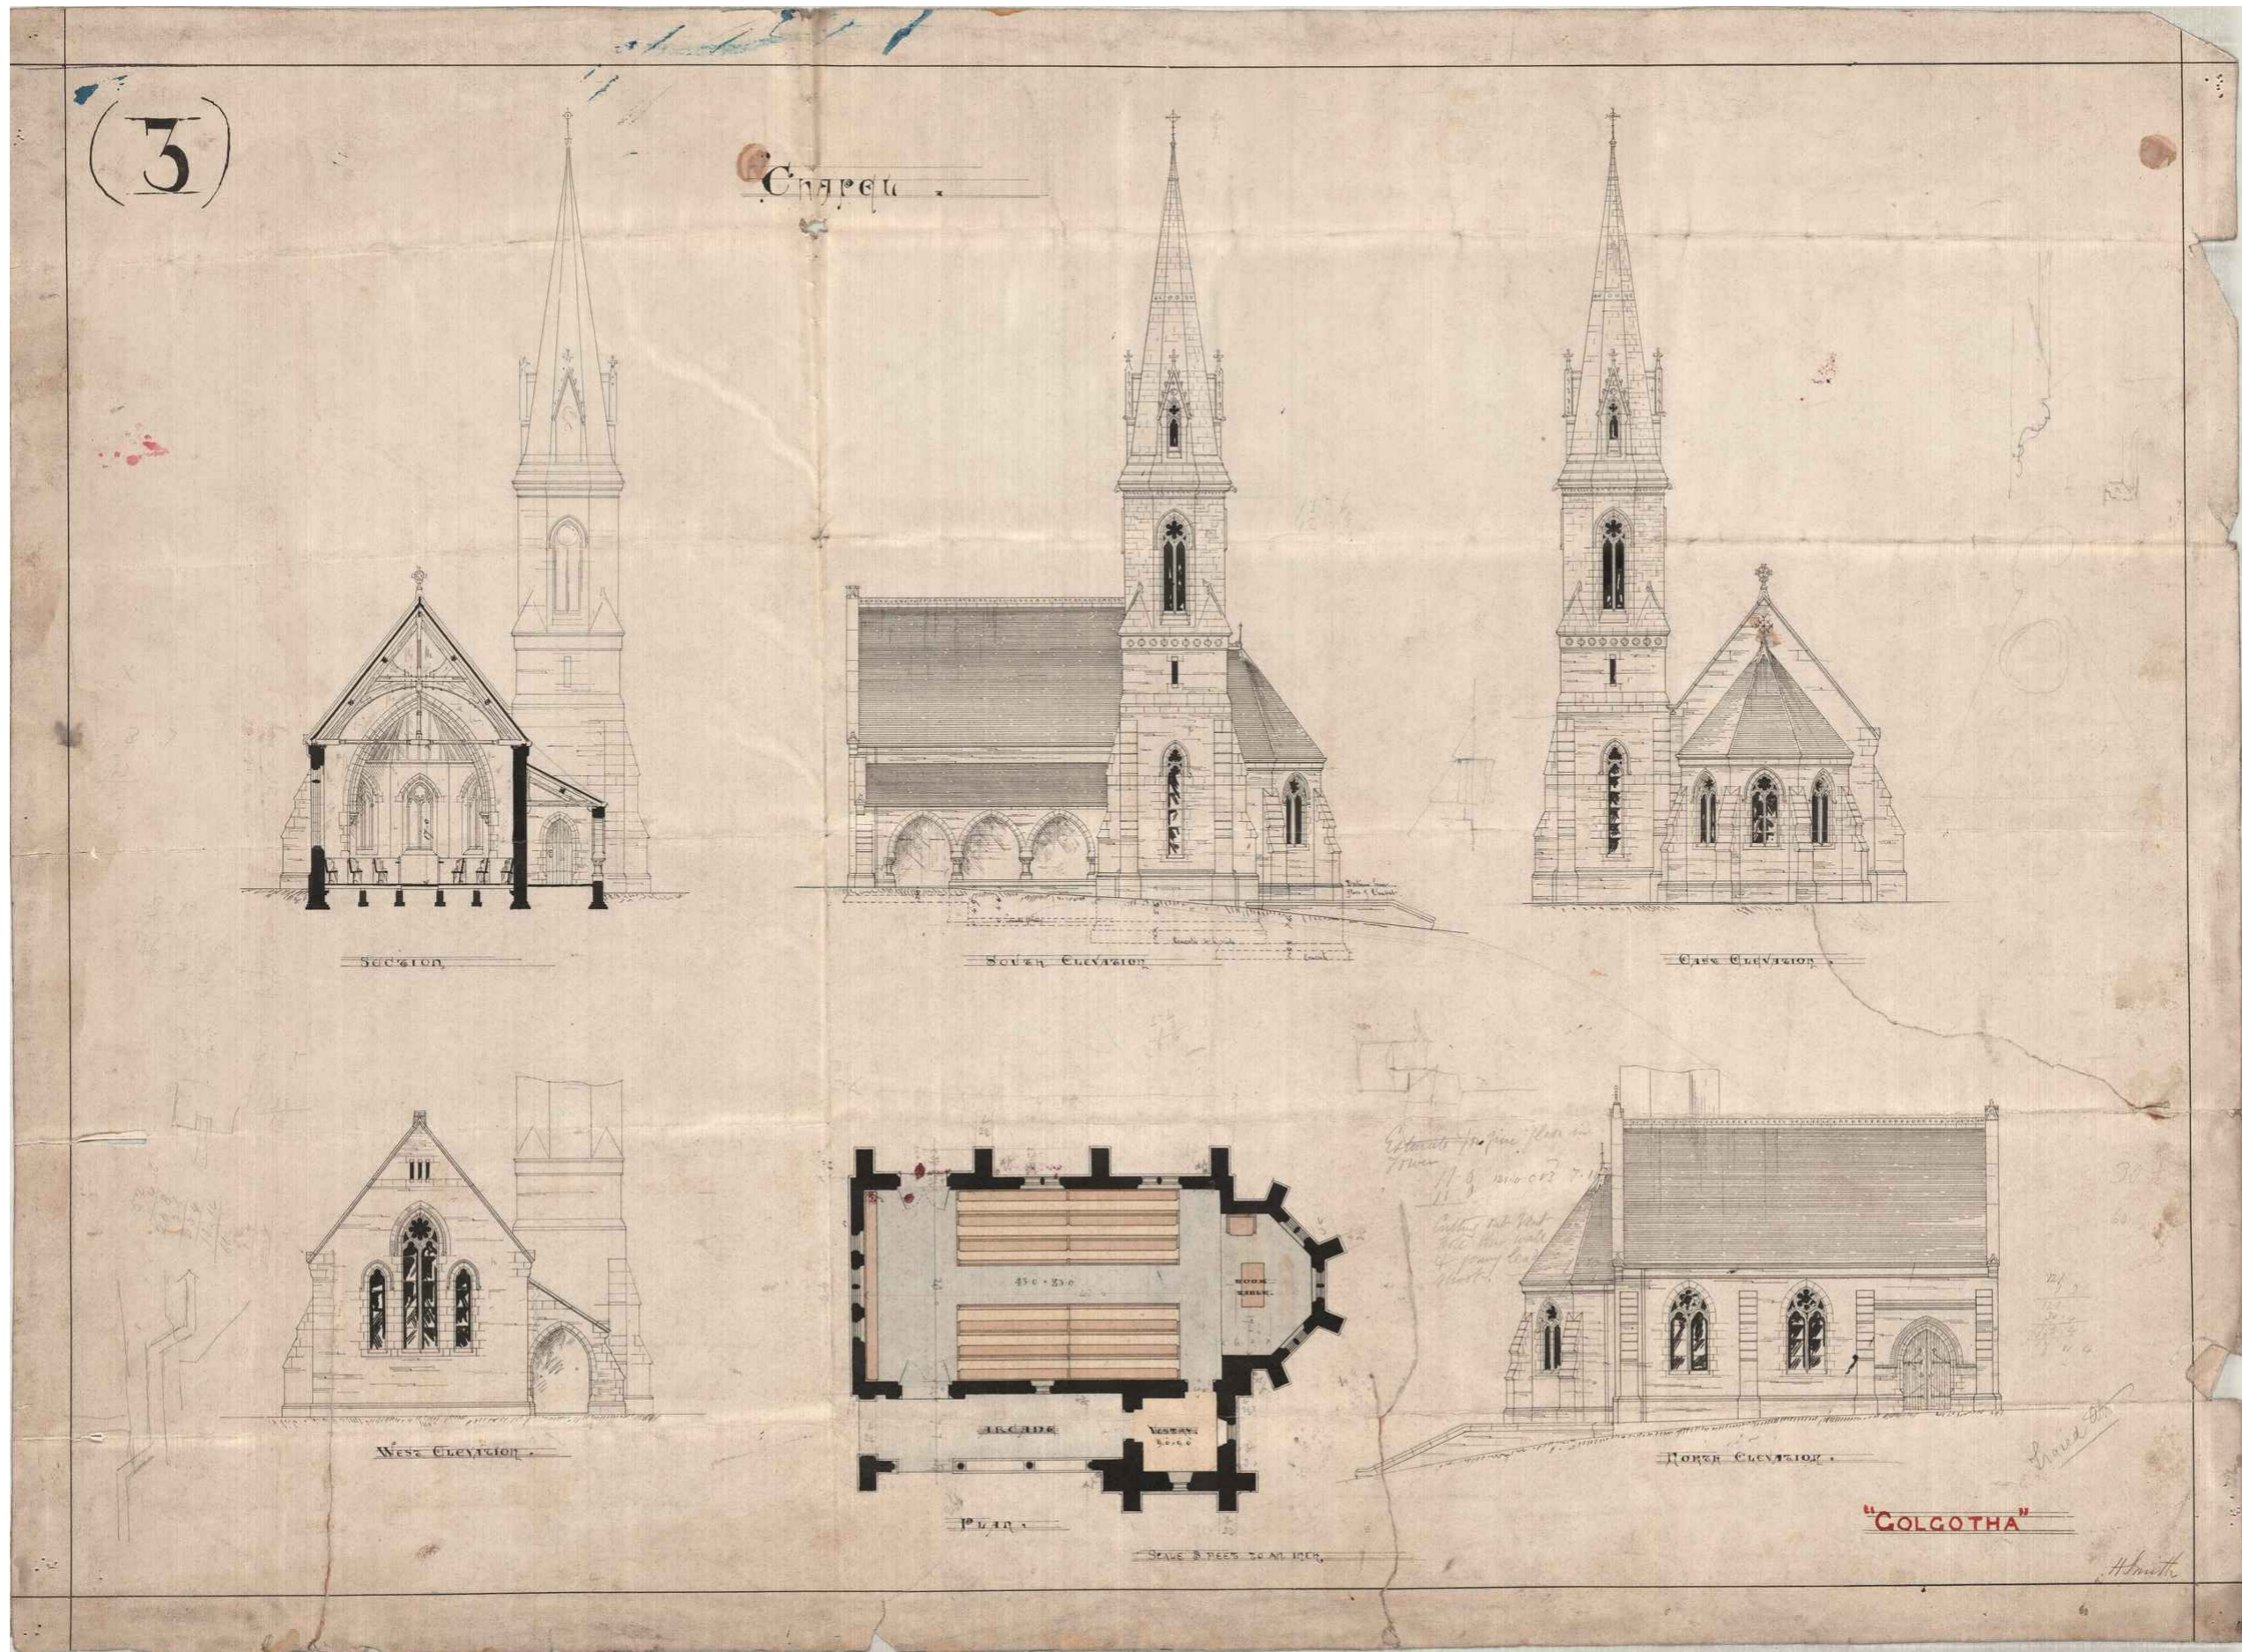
Original elevations and plan (courtesy of GAJ Architects (Stourport) via Dean-Walker Hollingworth Architects)
